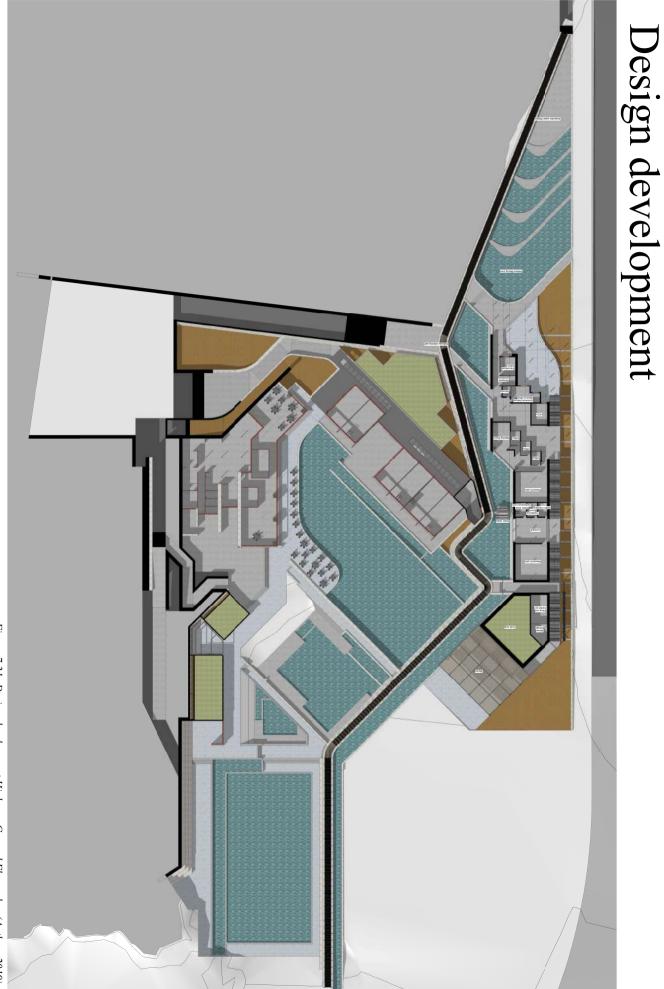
Design development Highway Ground Floor plan (Author, 2019)
